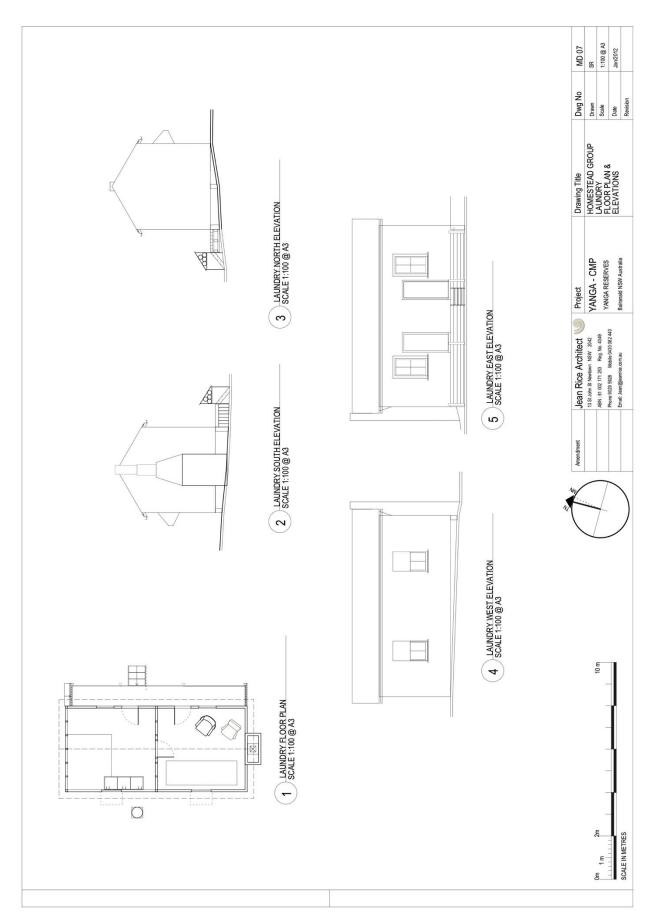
Homestead Group - Laundry floor plan & elevations and elevations. Jean Rice Architect, site assessment 2009.
